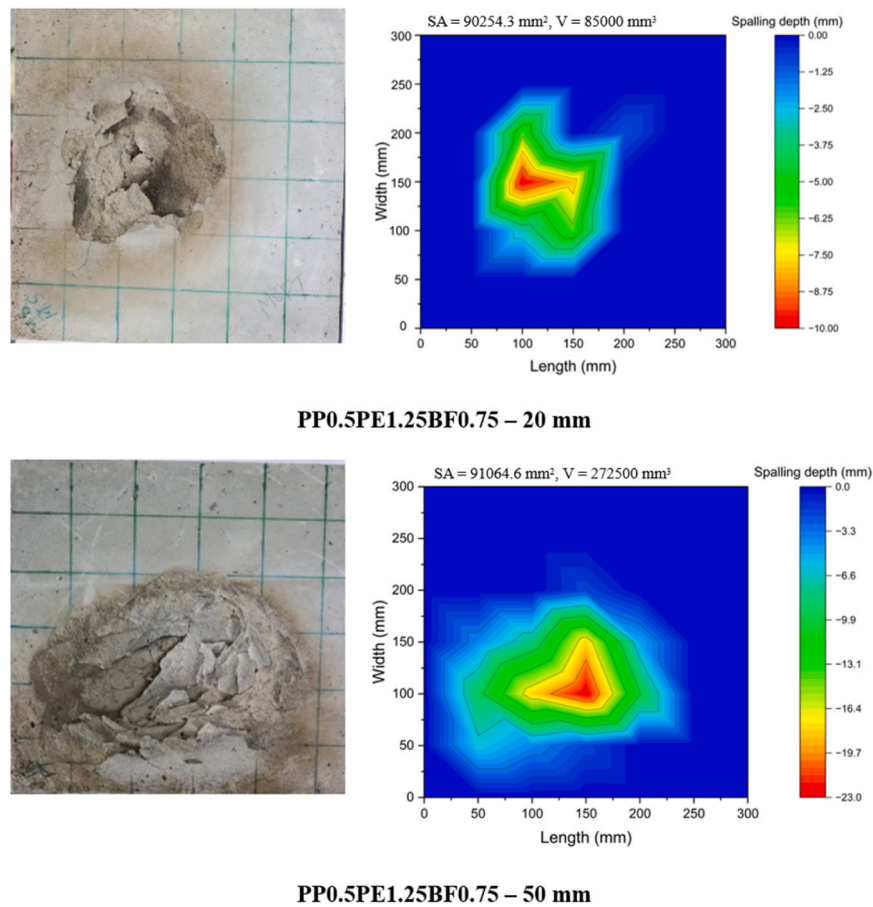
Picture (left) and surface profile (right) of mix PP0.5PE1.25BF0.75 – 300 × 300 mm panel specimens after 1-D blowtorch test.
